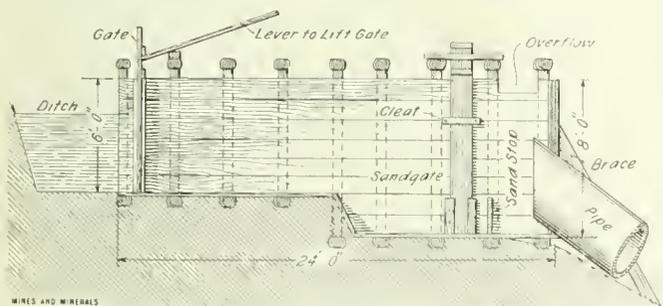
PENSTOCK CONNECTING PIPE LINE WITH DITCH
